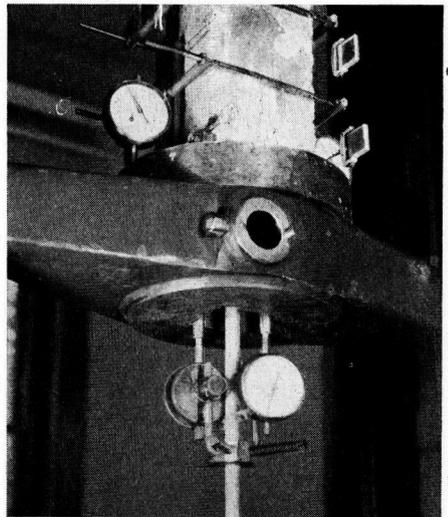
Pull-out specimen showing detail of arrangement for measuring slip at the loaded end of the bar.
